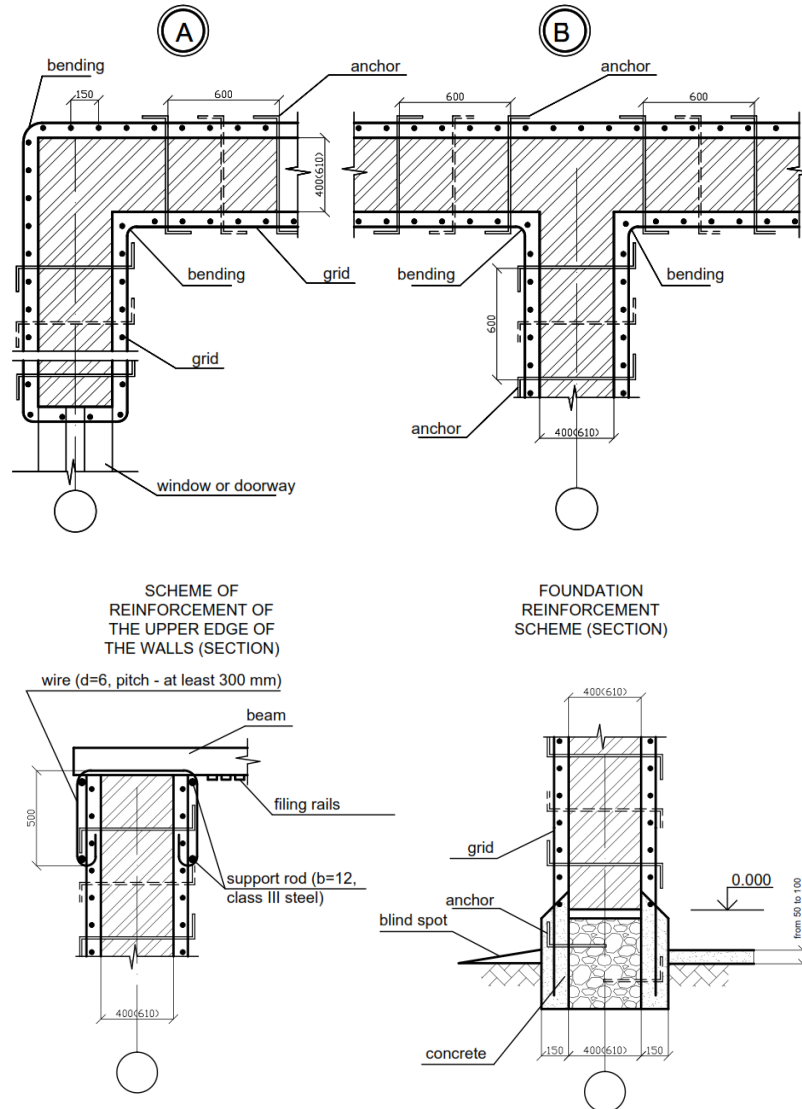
Reinforcement of adobe walls and foundations with reinforcing grids in a layer of high-strength mortar.
